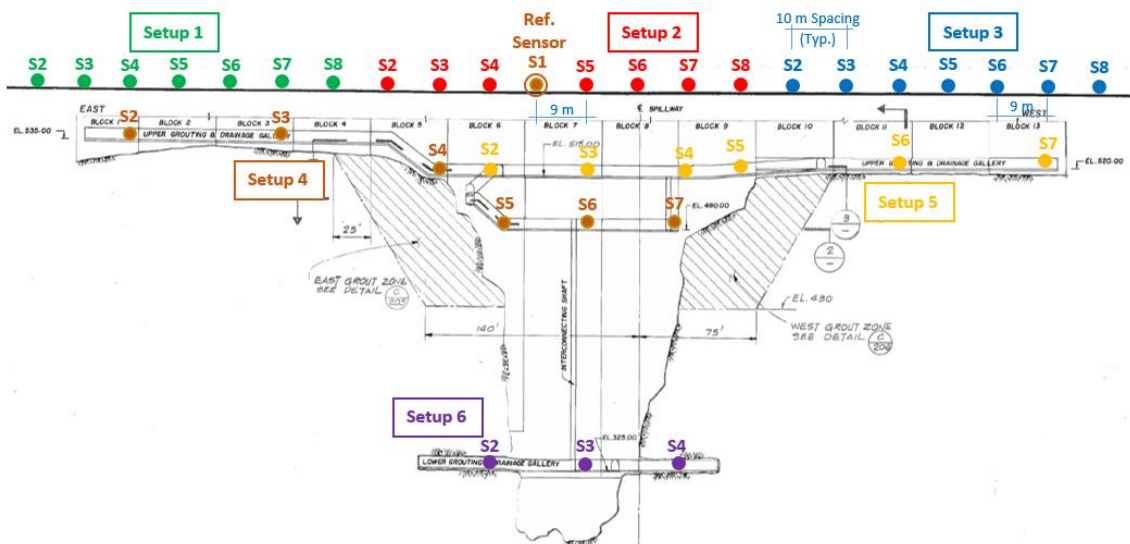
Downstream elevation of the dam and location of sensors on the crest, and location of measurements setup inside the galleries (Setup 4, 5 and 6).
